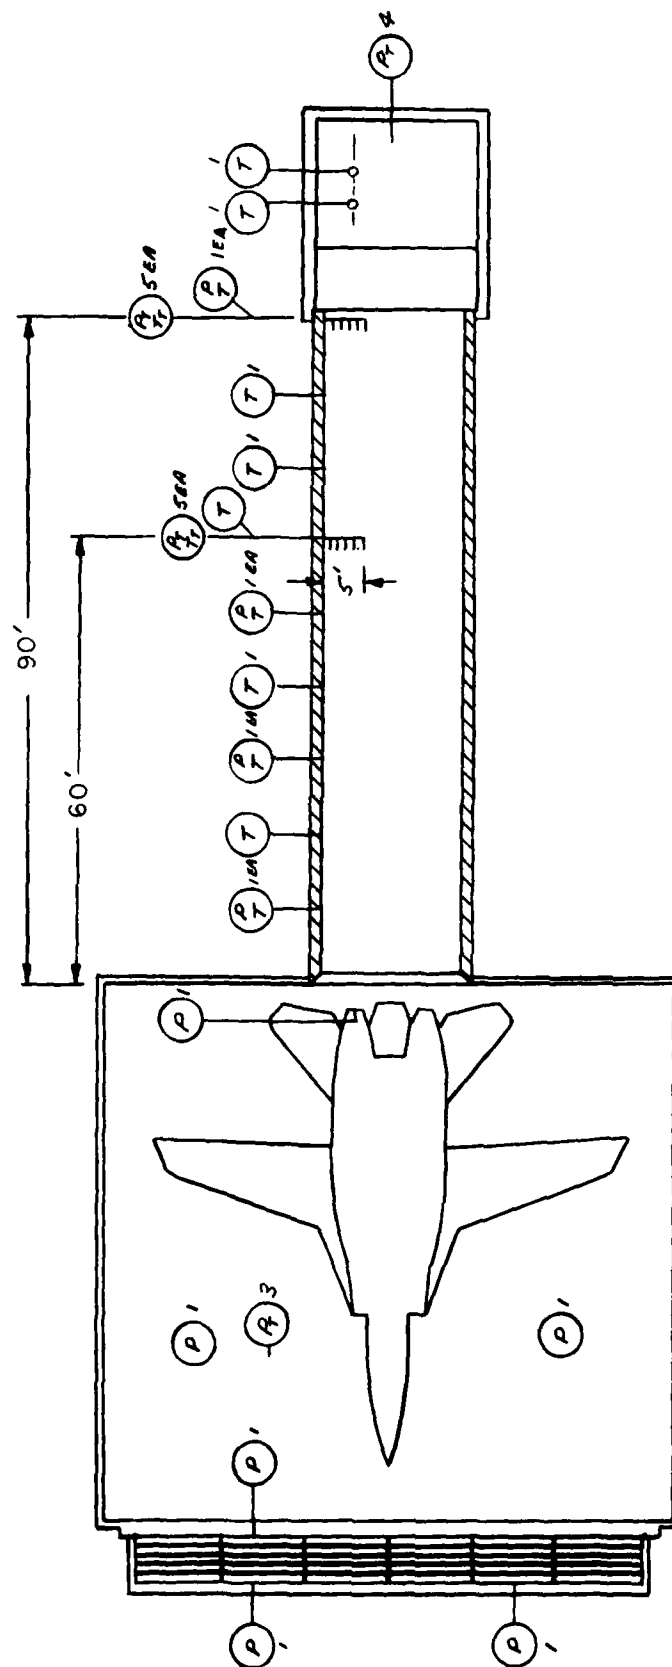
PLAN VIEW OF NAS MIRAMAR HUSH HOUSE SHOWING INSTRUMENTATION LOCATIONS FOR CHECKOUT
